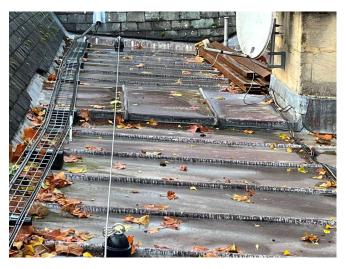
Area 2 – Stair 4 - towards Stair 3
